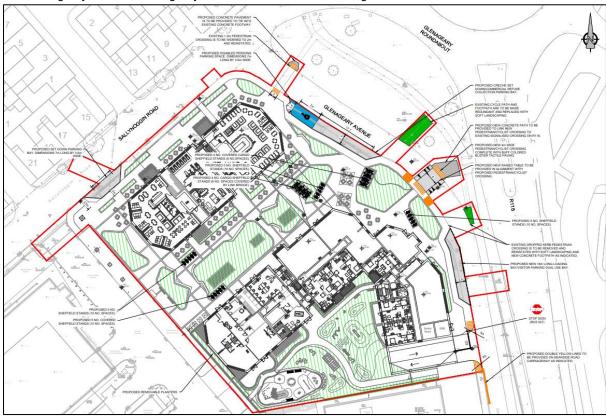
Proposed General Arrangement (AECOM Drawing: 60690914-ACM-00-00-DR-CE-10-0001)
